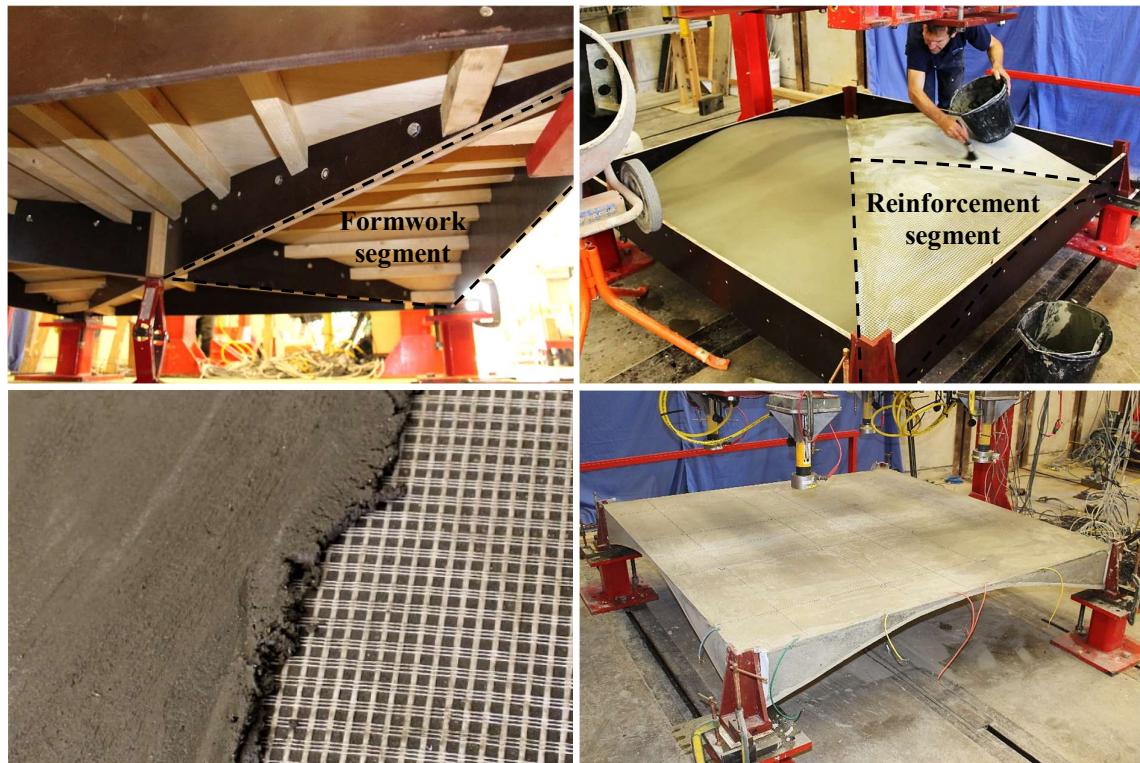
Underside of formwork, application of a reinforcement layer, finished shell with foamed concrete fill and detail of TRC construction, clockwise from top left.
